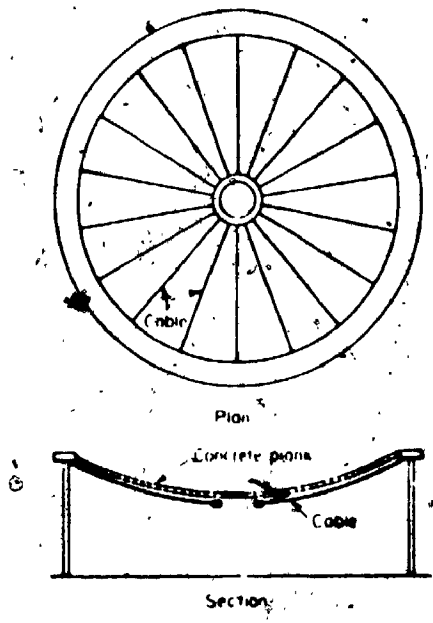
Circular Tension Roof, Decking Placed Over Cables, [5].
